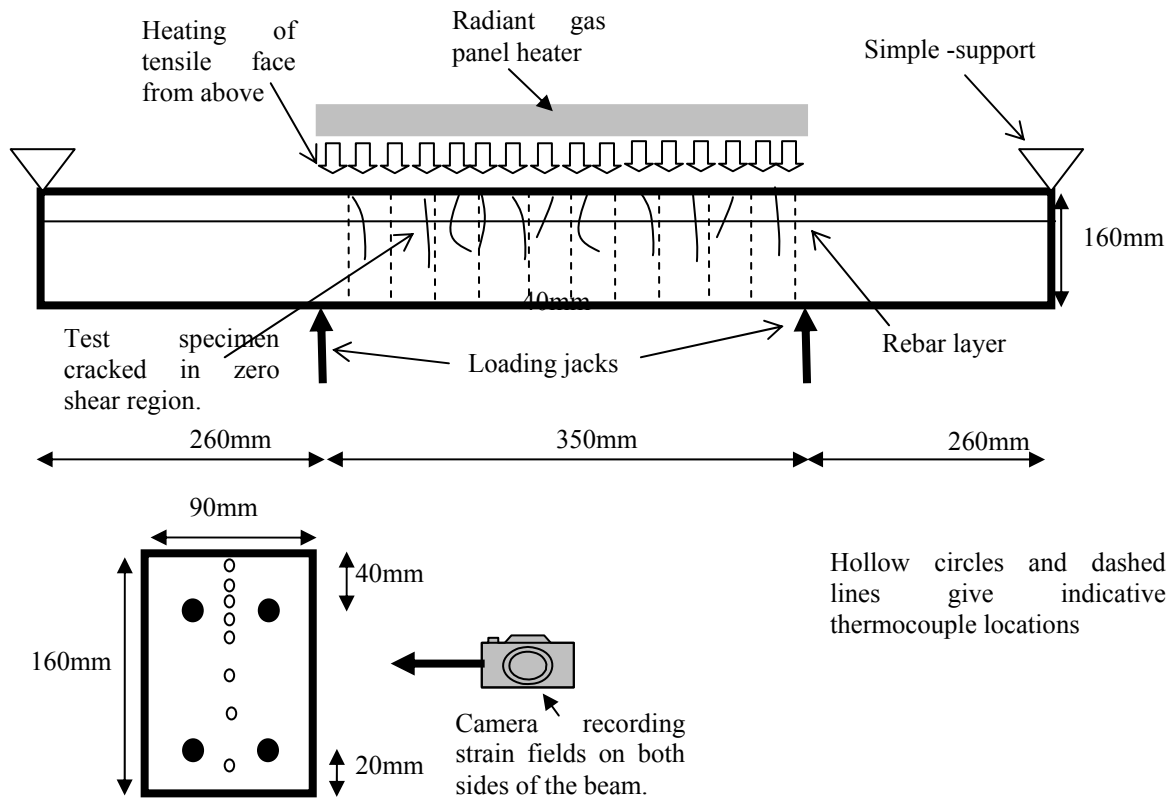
Experimental setup showing side view of loaded beam and a typical cross-section.
